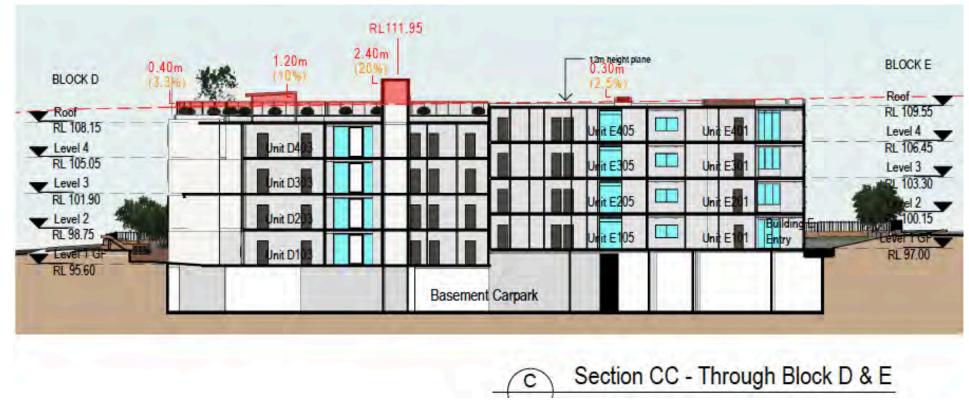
Areas that exceed maximum building height – Section through Blocks D and E
